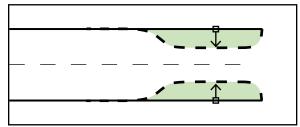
Stormwater curb extensions commonly have a symmetrical orientation at intersections.
